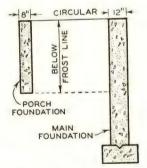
Section at E-E of Porch and Main Foundation Shown in Fig. 3
